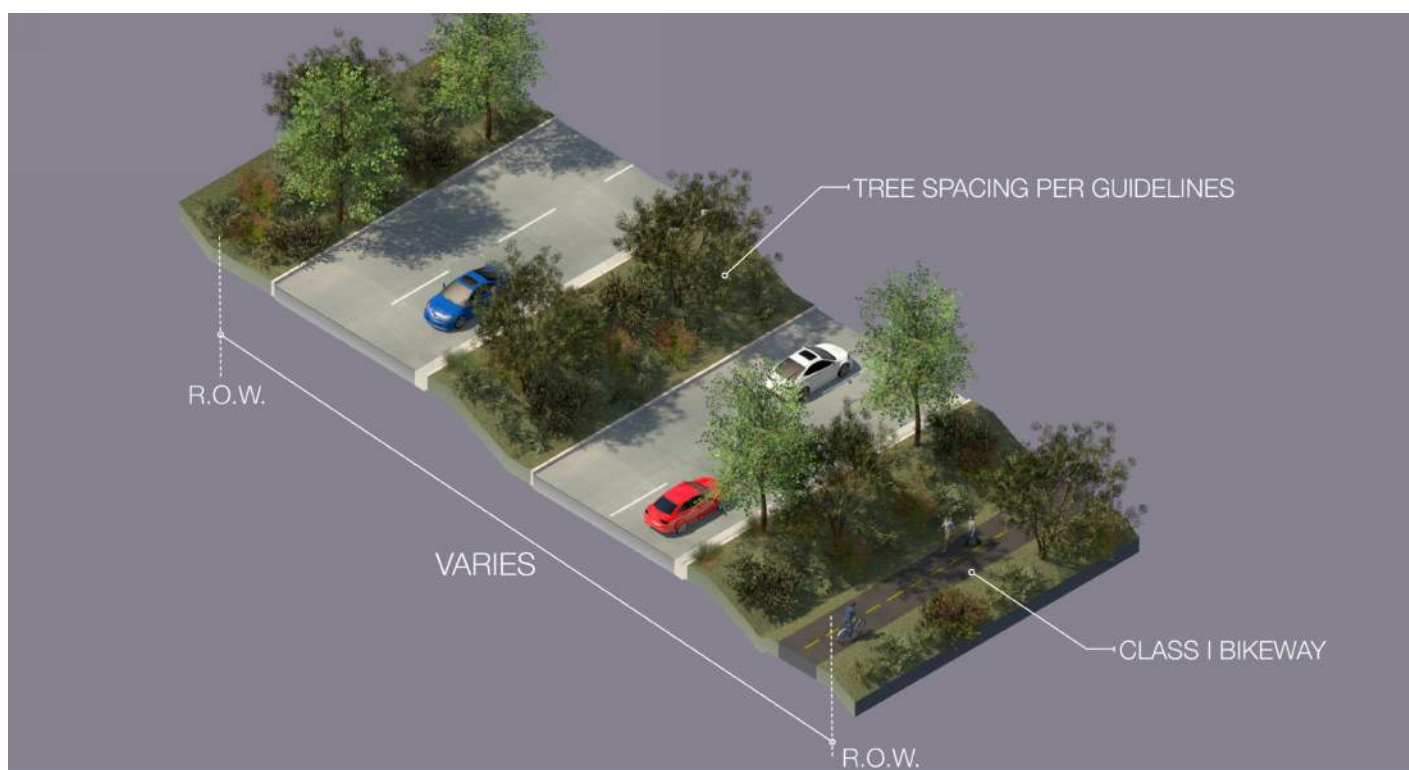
Street Axon – Western Bypass Corridor 2 (Public)
